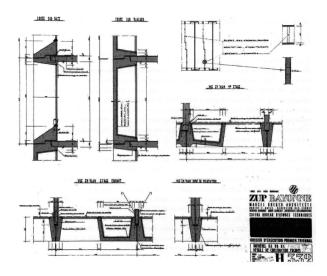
Marcel Breuer's ZUP details the attachment of the main structure with the precast panels. ¹⁴
